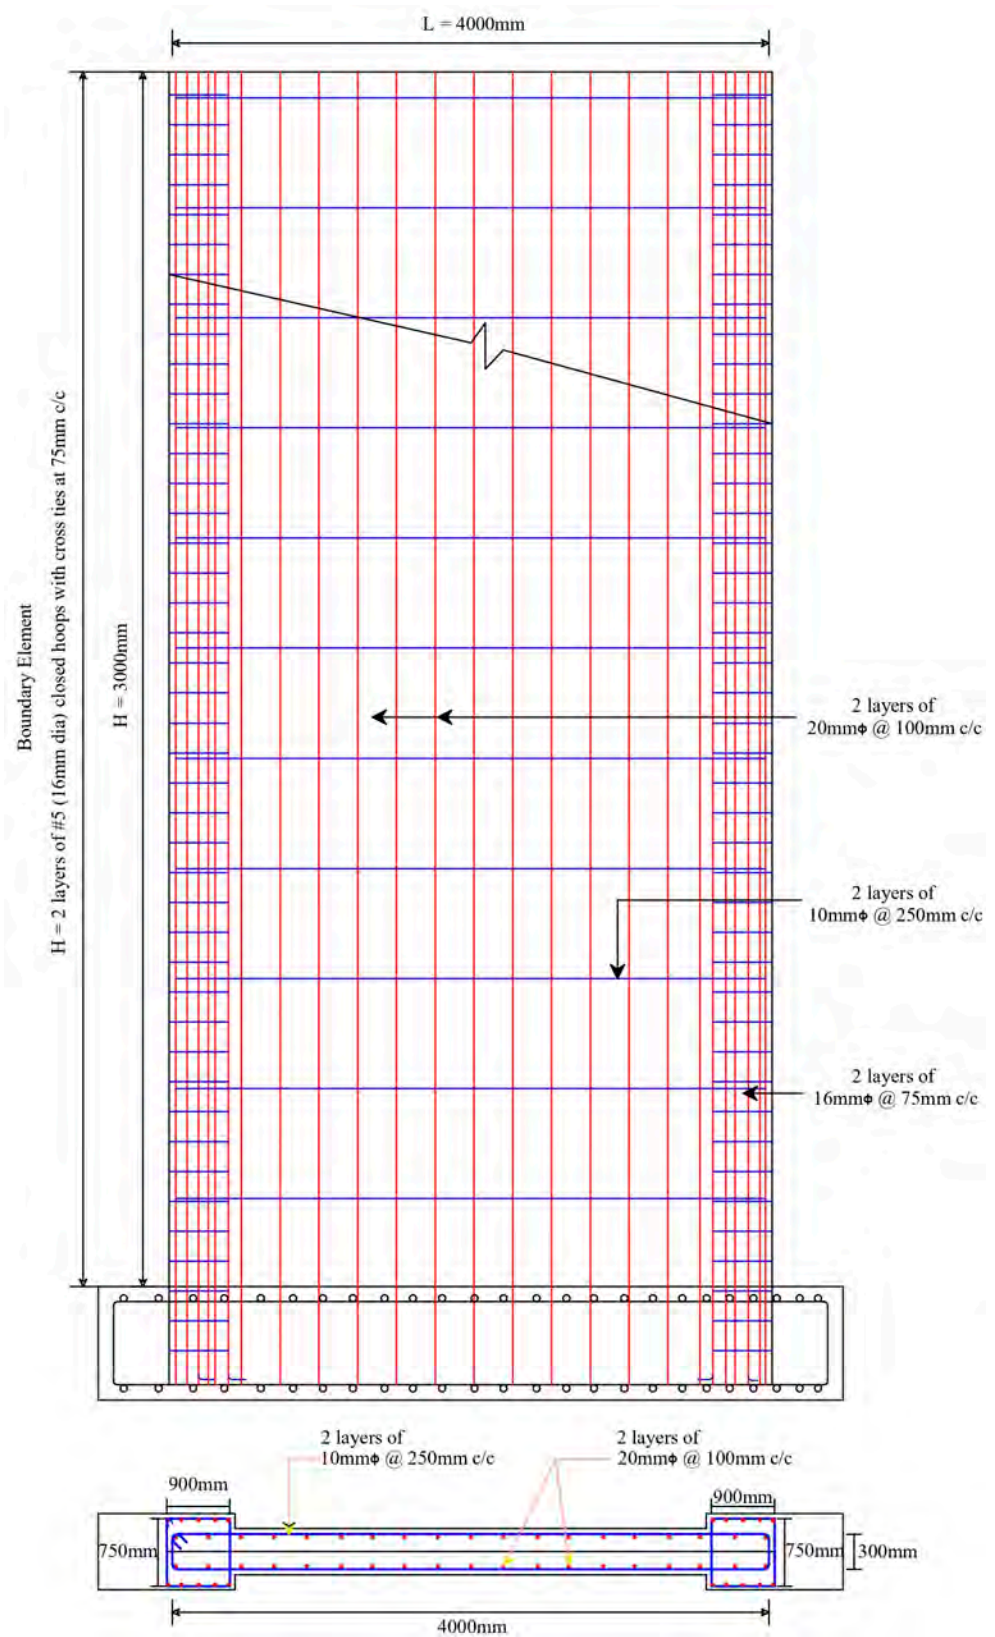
Reinforcement detailing of the 300 mm thick shear wall subjected to R3 blast cases (C-shaped building).
